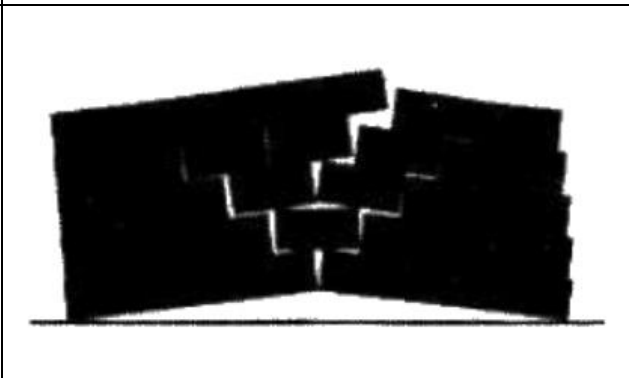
Wall Undergoing Hogging Strain Stage 4¹
